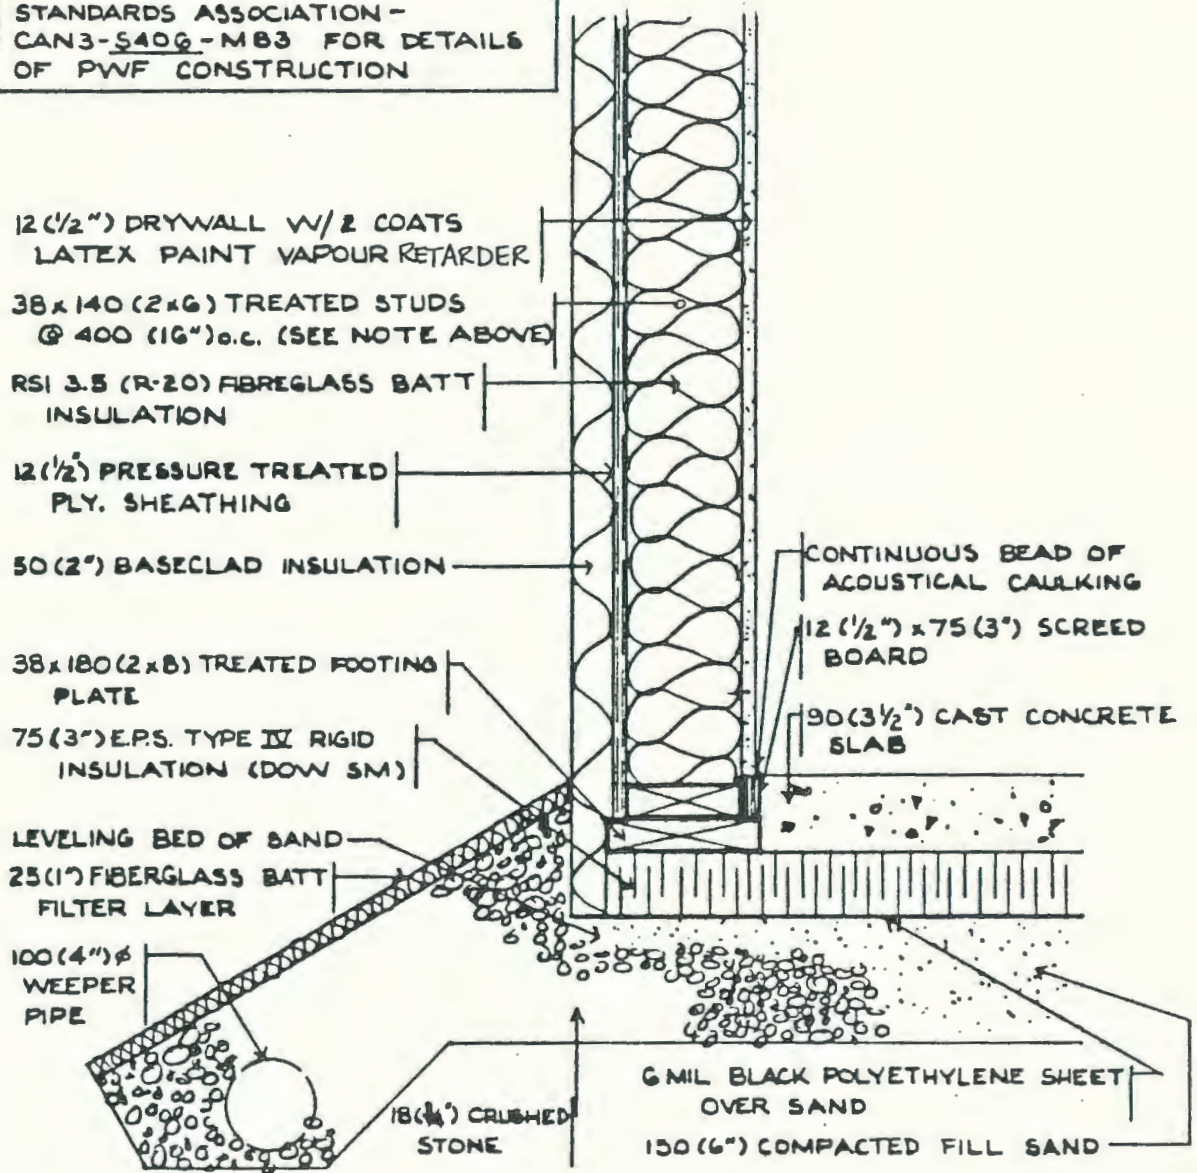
Alternative PWF Footing and Foundation - Alberta Demonstration House
